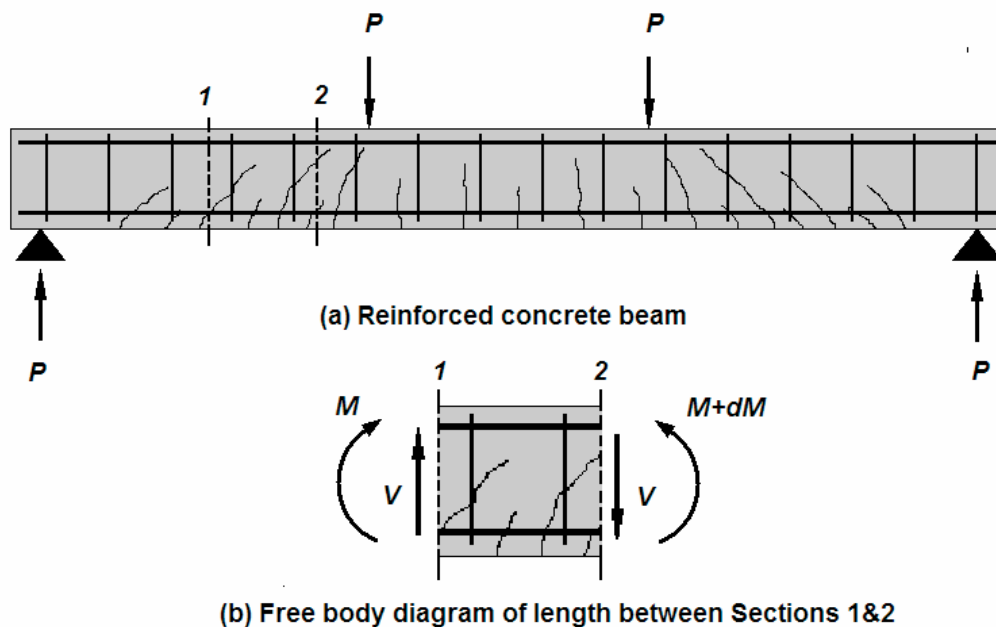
Reinforced concrete simply supported beam subjected to shear and moment.
